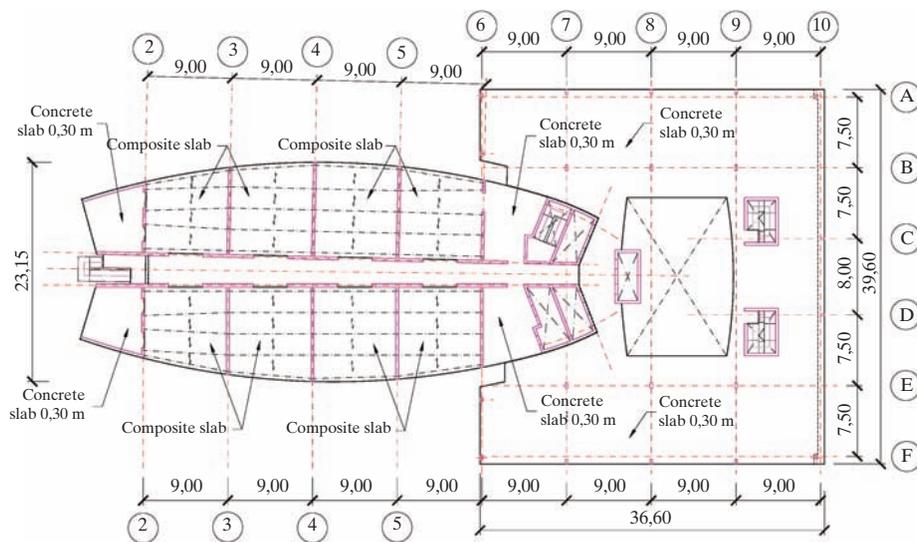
Typical plan view between level 1 and level 7 of the Tower and the Atrium (Units: m)
